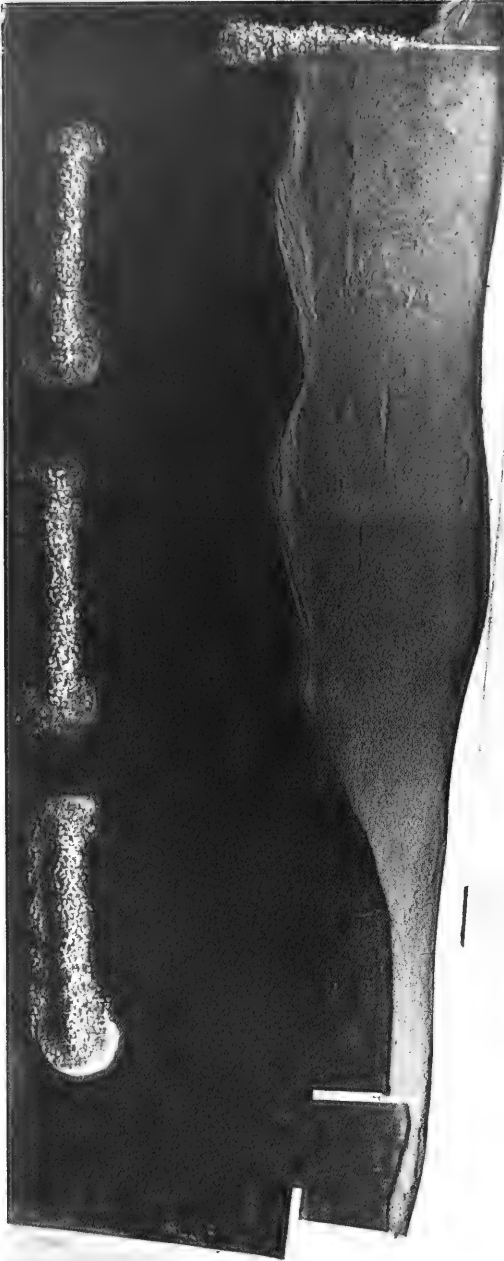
Shoreline erosion occurring east of the west groin for the as-constructed base test plan in the model of Lakeview Park
